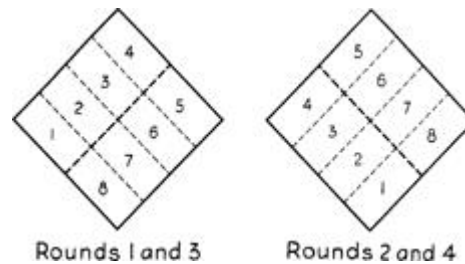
Order of Tamping in Molding of Test Specimens
